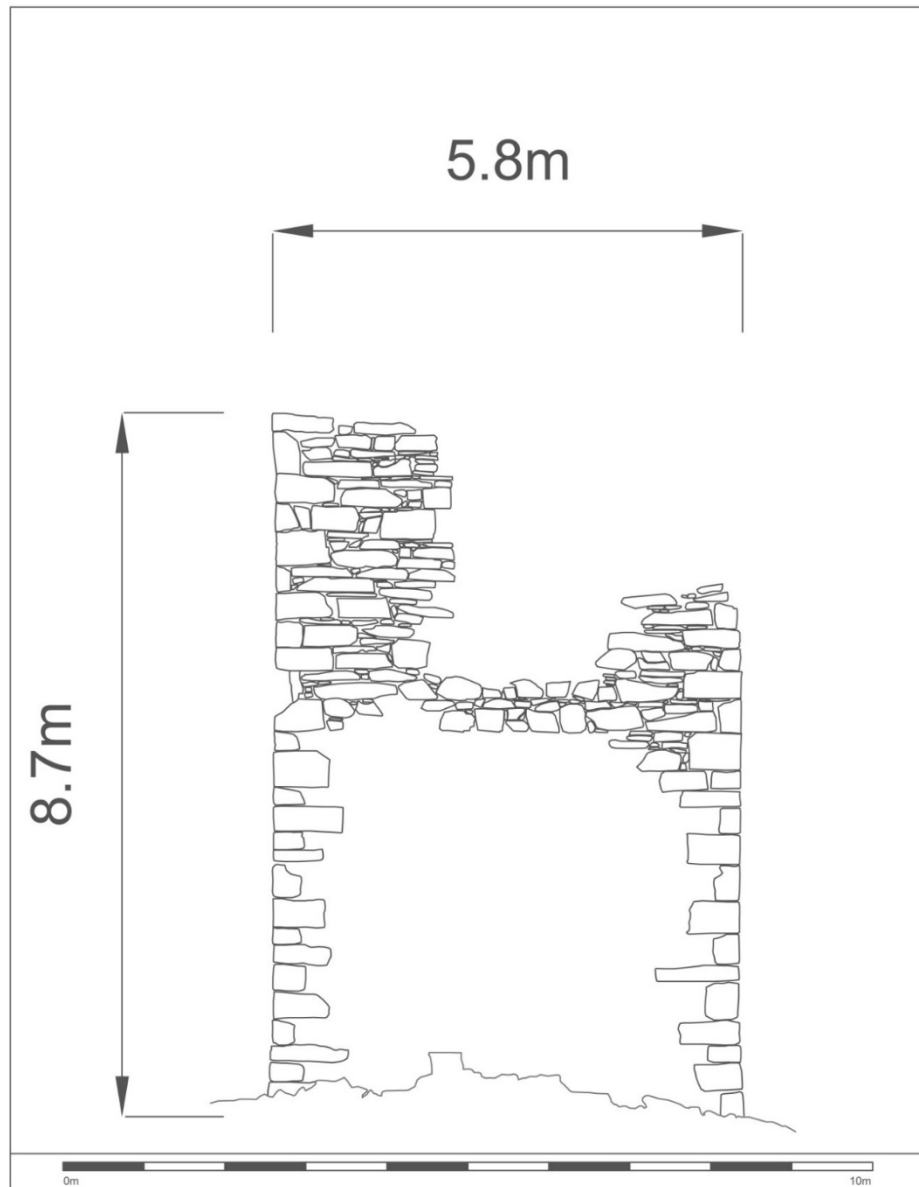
External elevation of the west wall of Clare Island Signal Tower.
